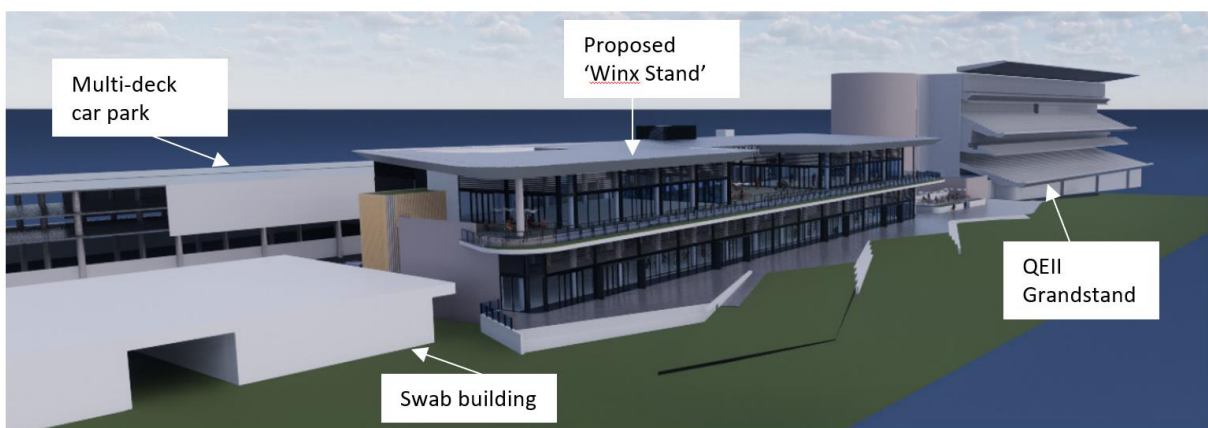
| Photomontage of the Winx Stand – trackside elevation (Source: Applicant's RtS)
